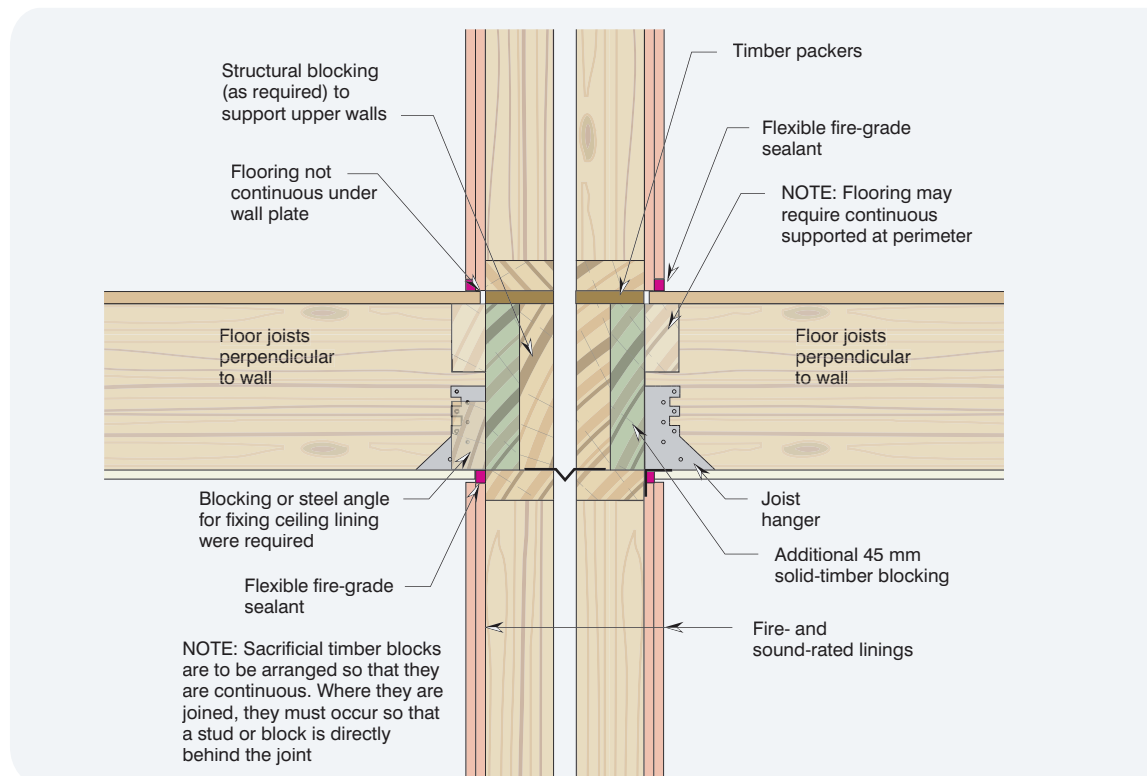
Joist perpendicular to wall, wall stud not continuous through junction – FRL 60 minutes – elevation view.
